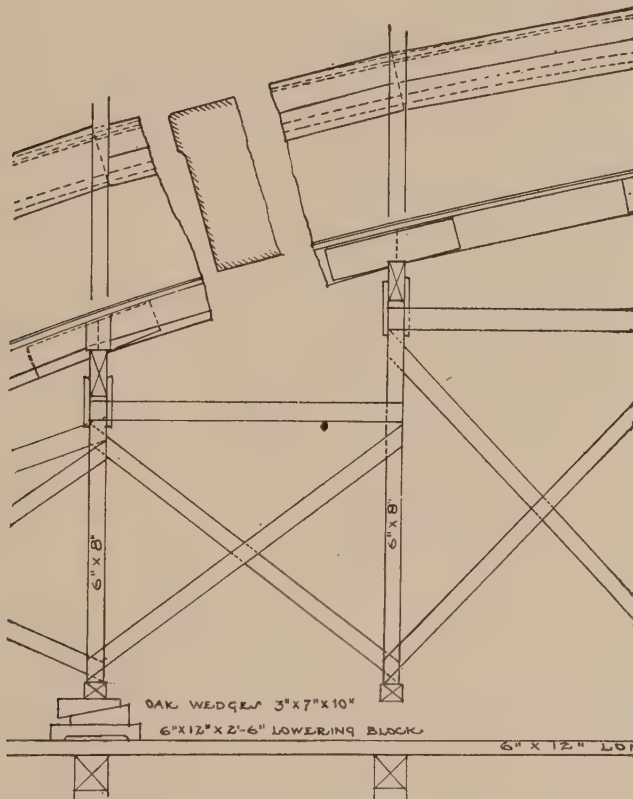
Shows portion of half side elevation of arch ring centering for one of the 122 ft. spans of the Charles River Bridge—Boston Elevated Company. (See Figs. 223a, b and c, for complete view.)
